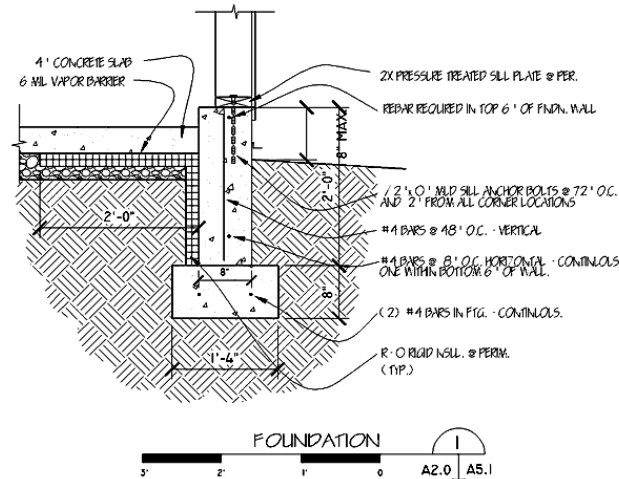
Example of poured concrete foundation wall detail (www.norsewoodsmith.com)
